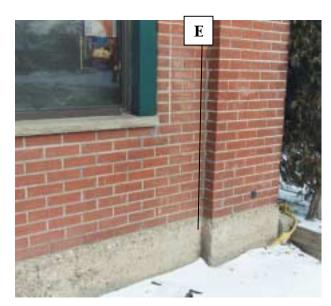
Pier adjacent to former garage opening $\mathbf{E} - \mathbf{Line}$ between new & old masonry
